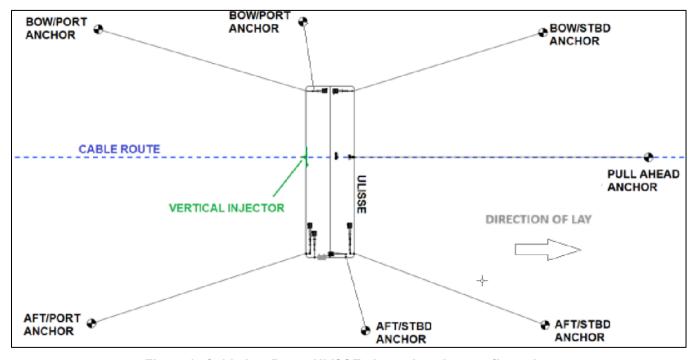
Cable Lay Barge ULISSE planned anchor configuration.
